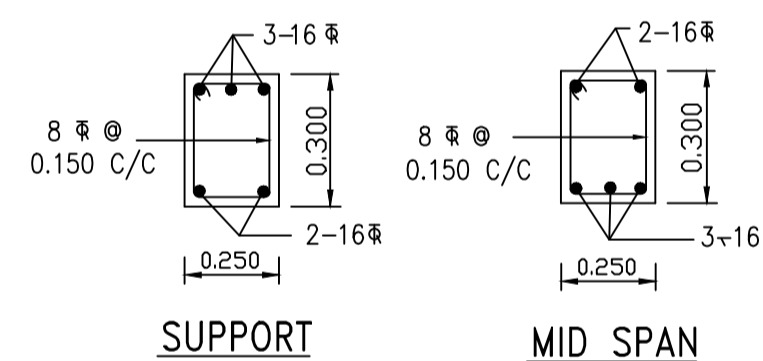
DETAILS OF TYPICAL FLOOR BEAM (0.250 X 0.400) (BEAM MARKED BY : B1)
